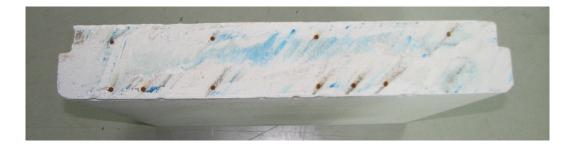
Joint Detail and Cross Section of ALC floor panel
